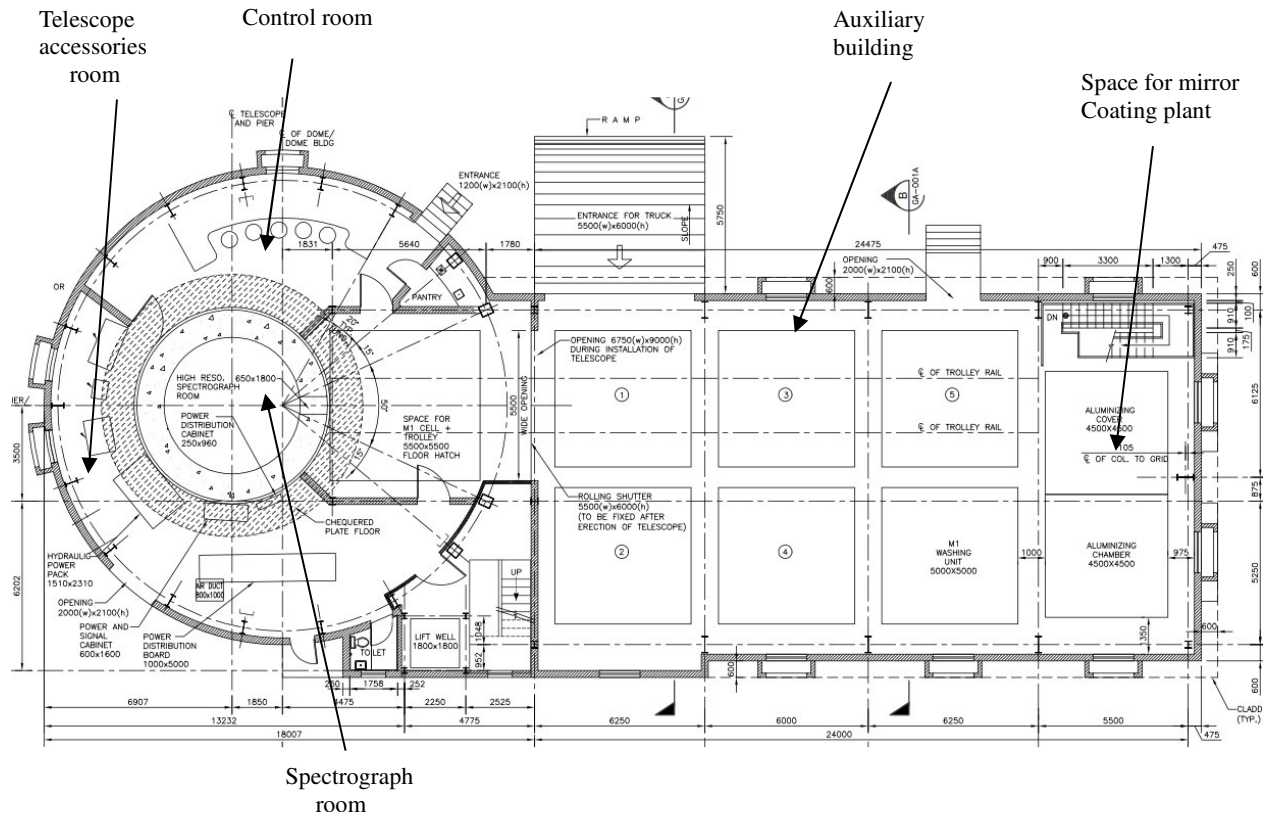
Floor plan at 0.0m level showing the auxiliary building, control room, telescope accessories room, spectrograph room, telescope pier
